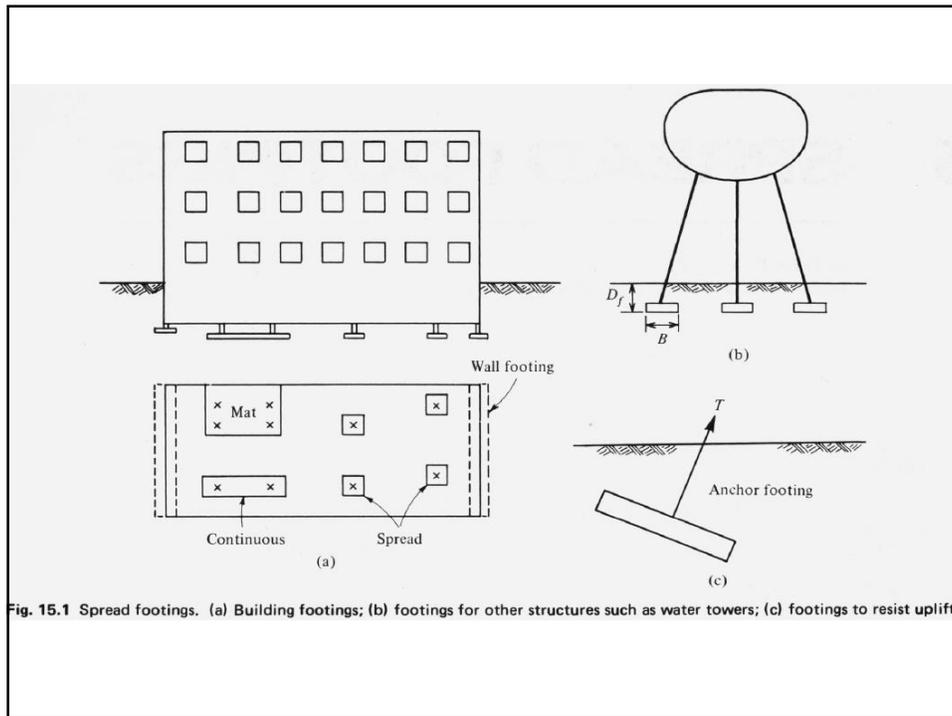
Spread footings. (a) Building footings; (b) footings for other structures such as water towers; (c) footings to resist uplift.
